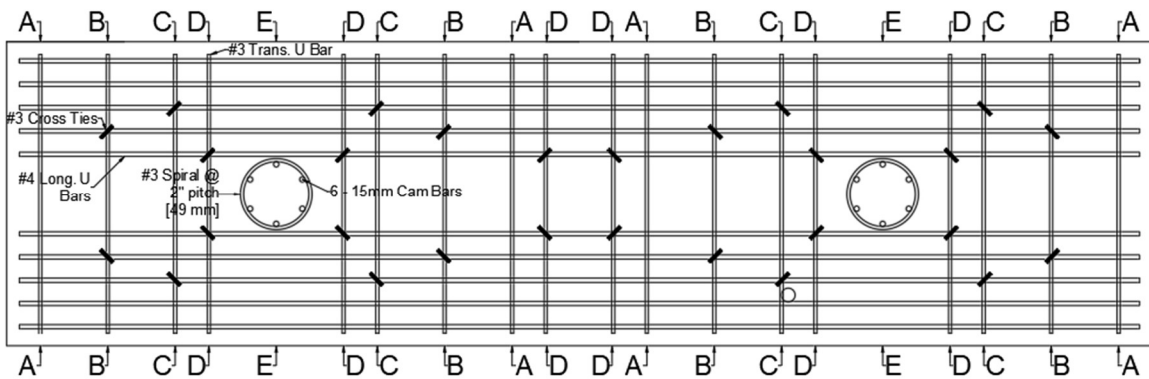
Plan view of locations of footing reinforcement cross sections
